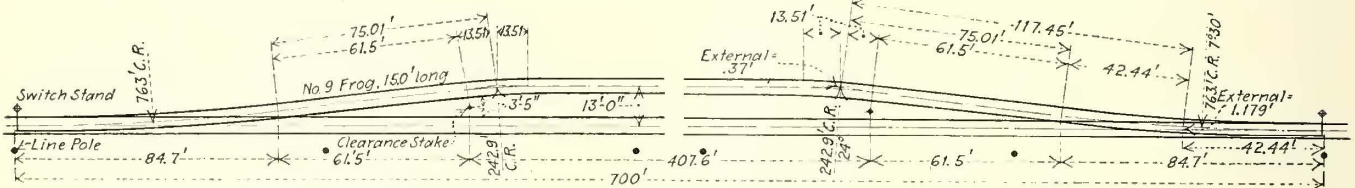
Track Construction and Maintenance—Through Type Electric Siding
